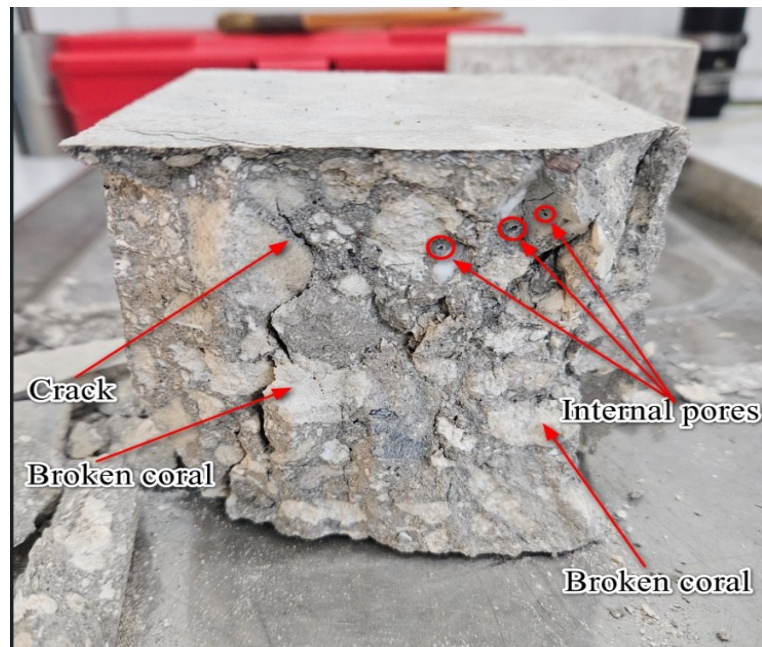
Failure modes of coral concrete cube specimens under cyclic loading
